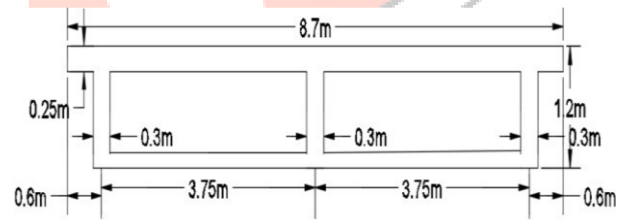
Cross section of Rectangular Double cell Box Girder.
